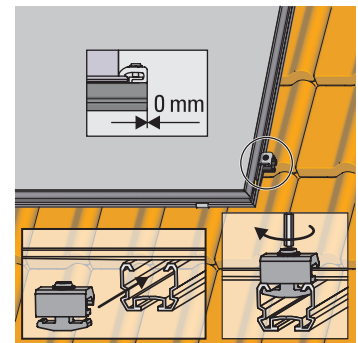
Insert the individual clamping blocks for the last flat solar panel and tighten down.
